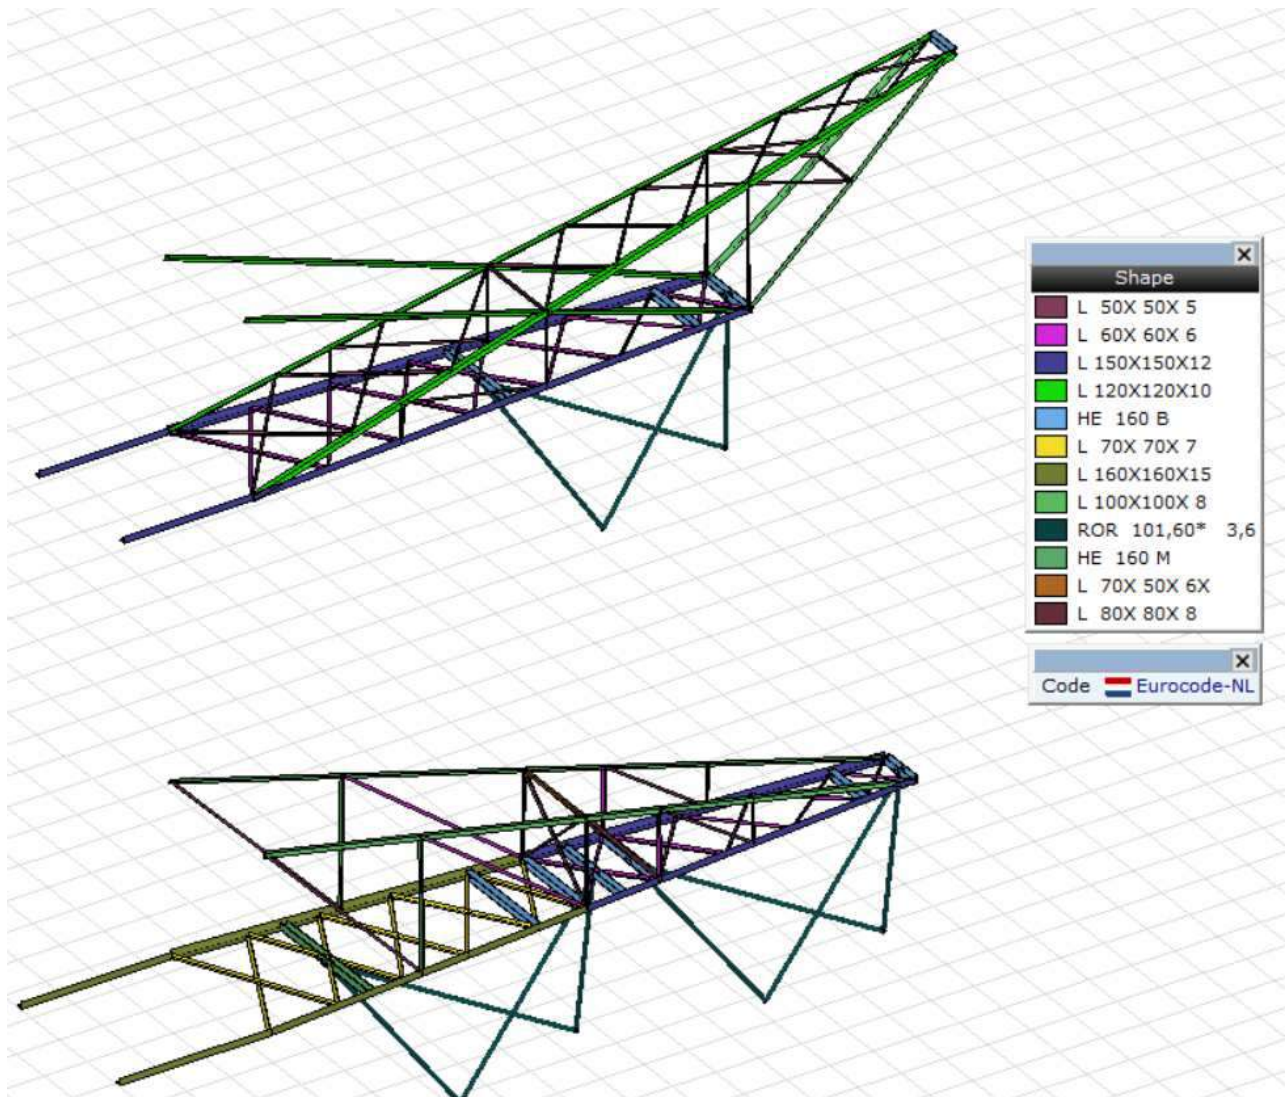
Location of the v-ketting insulator assembly in S-6 tower
